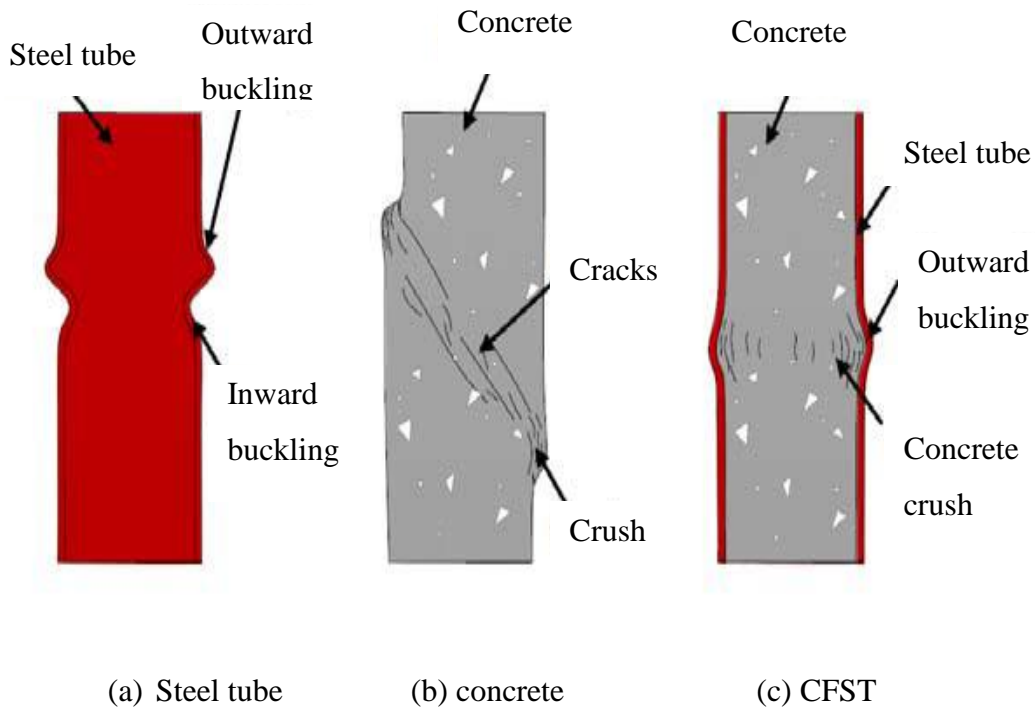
Failure modes of hollow steel tube, concrete and CFST stub columns (Han et al., 2014)
